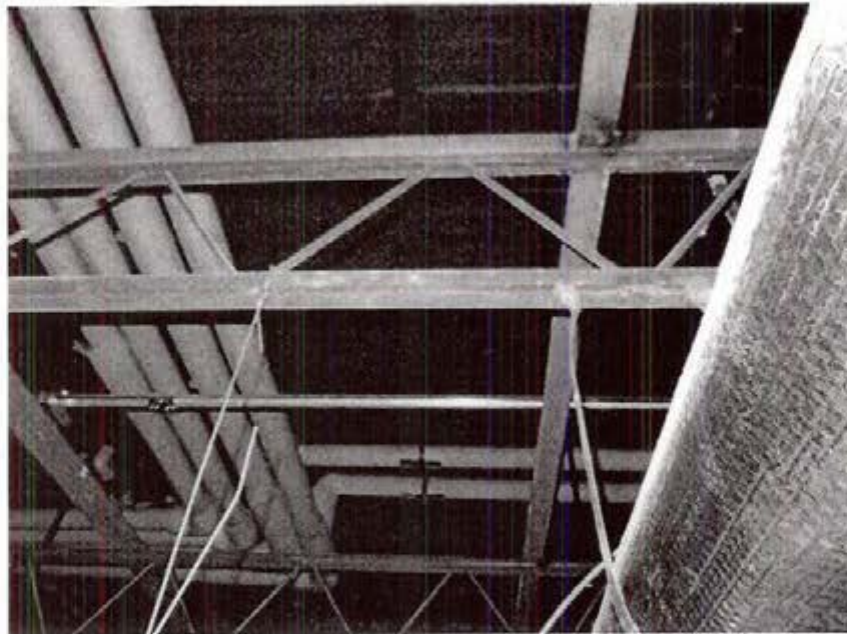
Lead wipe sample (042414-IFR-W-07) collected from a metal cable tray; above the drop ceiling of DOL-15.
